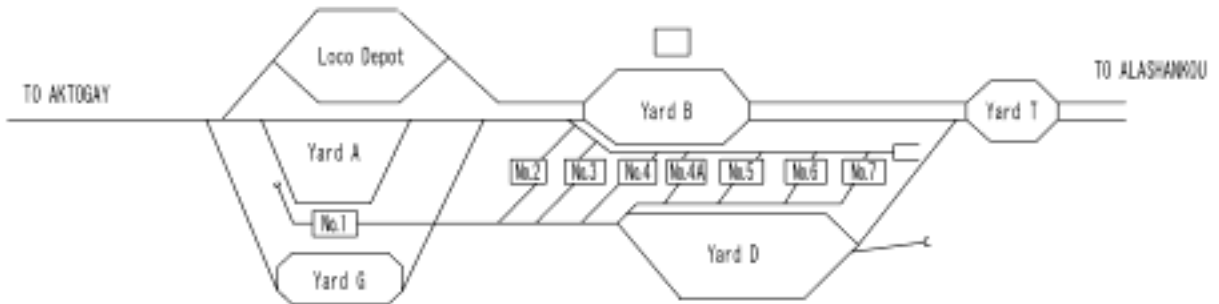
Layout of Facilities at Dostyk Terminal
